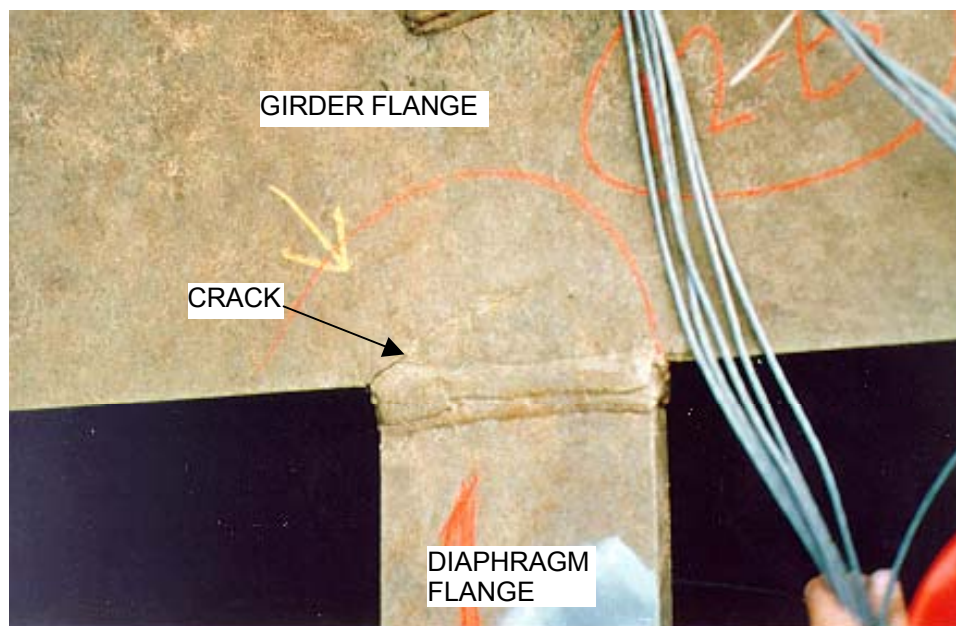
Cracked girder tension flange at diaphragm of a lift gate
